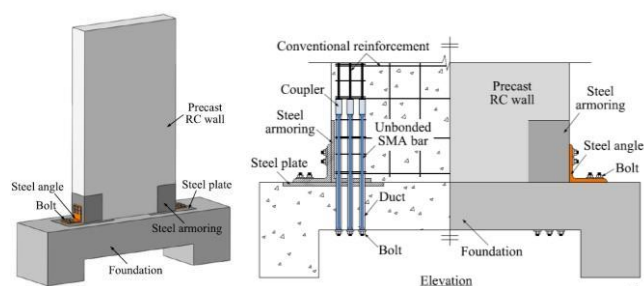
RC wall with ED and SMA in 3D (a), a cross-section of Shear wall to foundation connection (b)[12]
